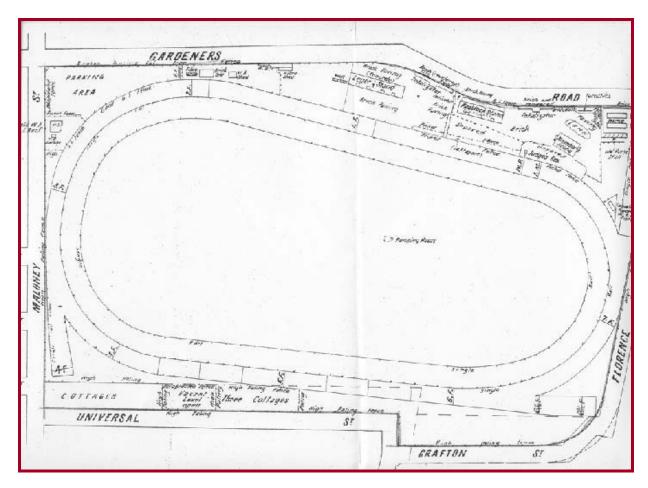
Undated plan of the racecourse, possibly detailing the 1928-9 refurbishment.
